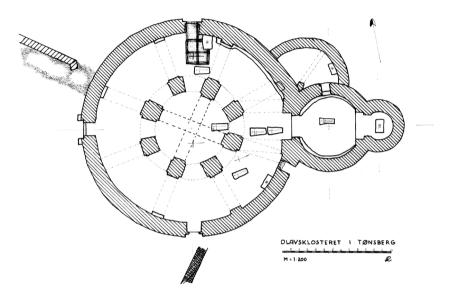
Church-plan with arches for the vaulting. Illustration: Ø. Lunde.
